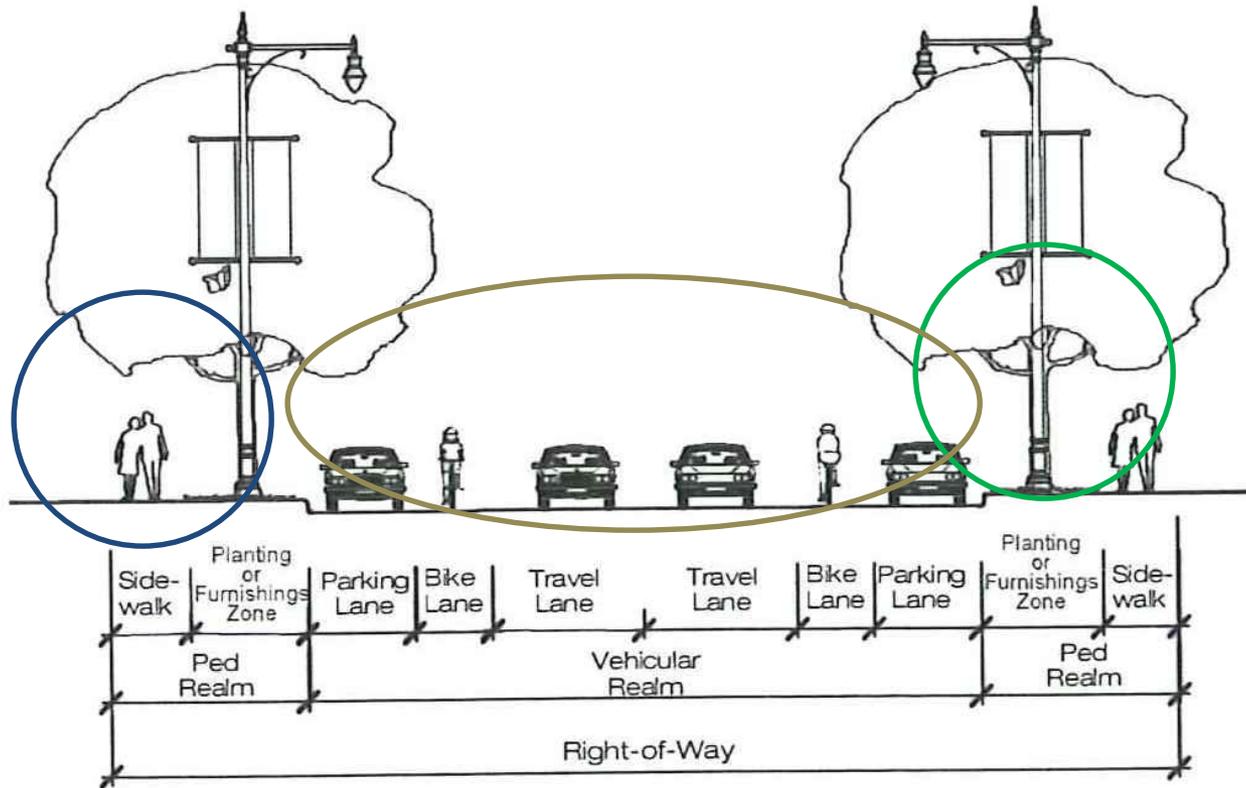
(b)-1: Typical Right-of-Way Elements.
